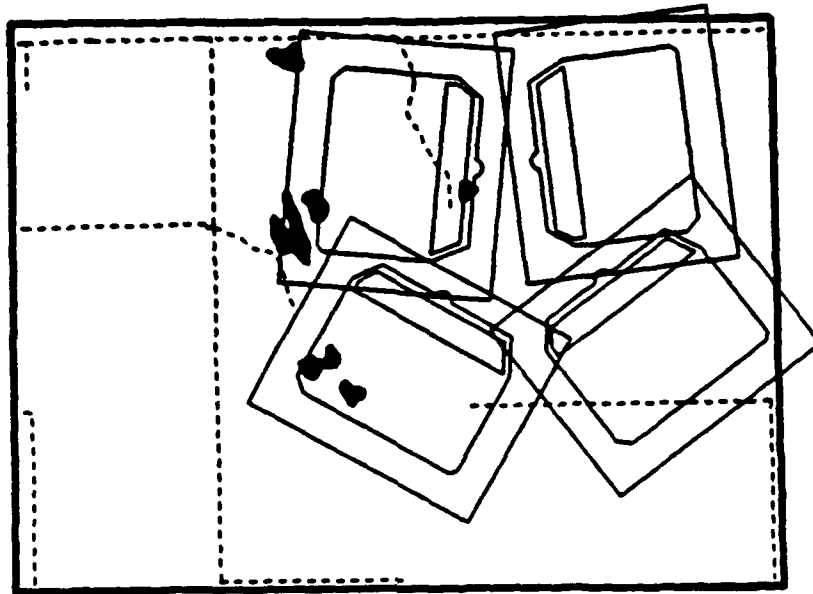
TX-NORTH PRELIMINARY SITE LAYOUT
